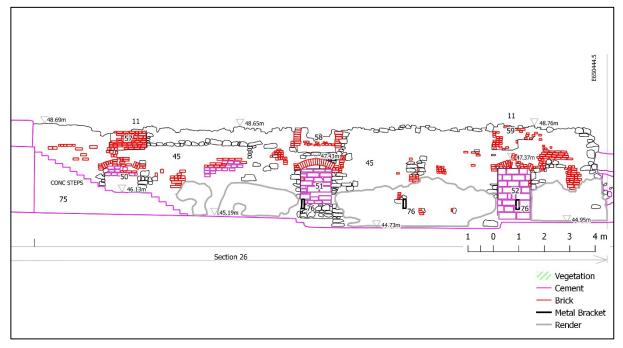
Elevation drawing of the upstanding remains of the Horse Barracks Building (AMS 2018)
